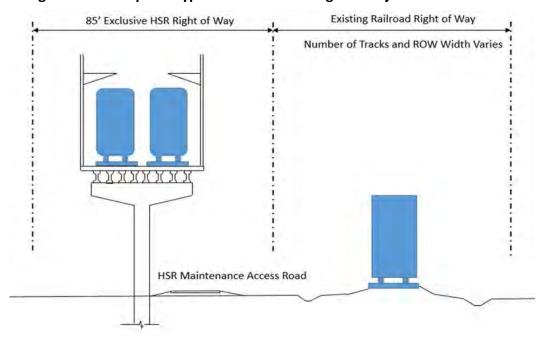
Conceptual Typical Section Showing HSR Adjacent to a Railroad
